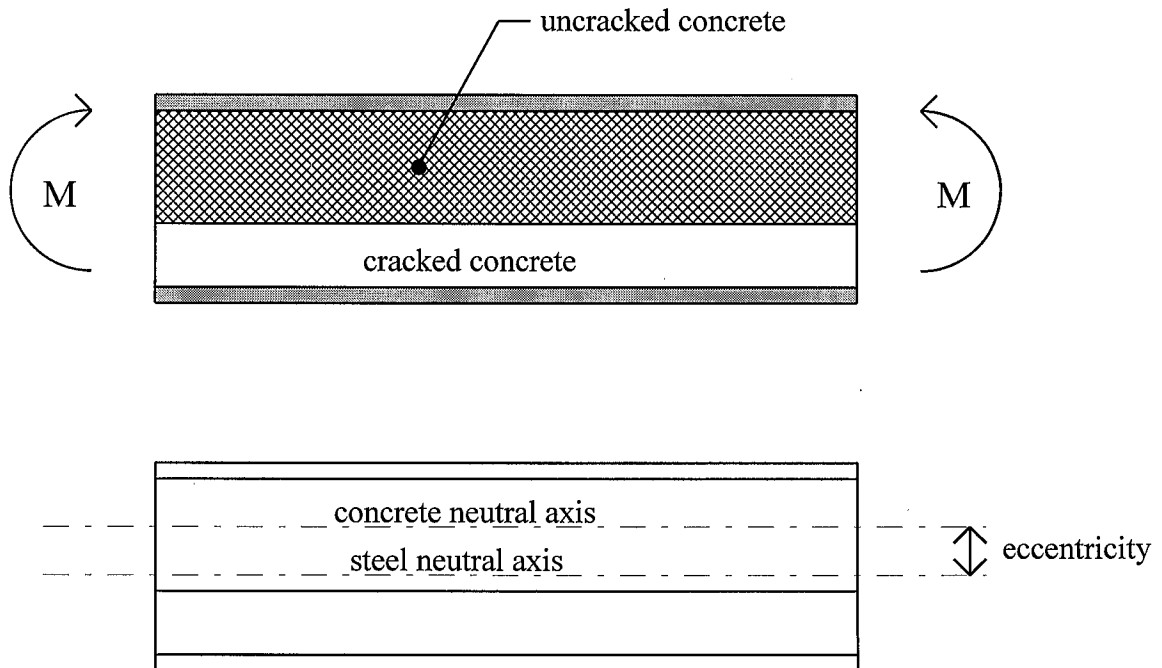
Unsymmetric Section Caused by Concrete Cracking
